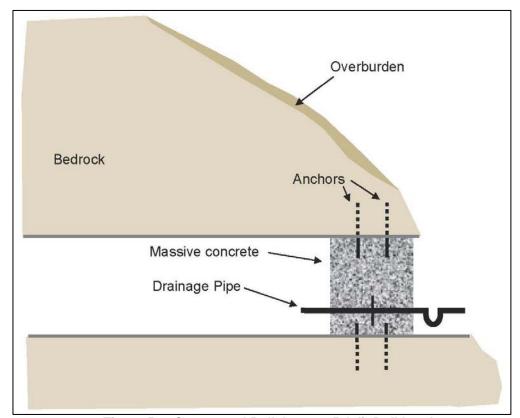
Conceptual Bellekeno 625 Adit Bulkhead
